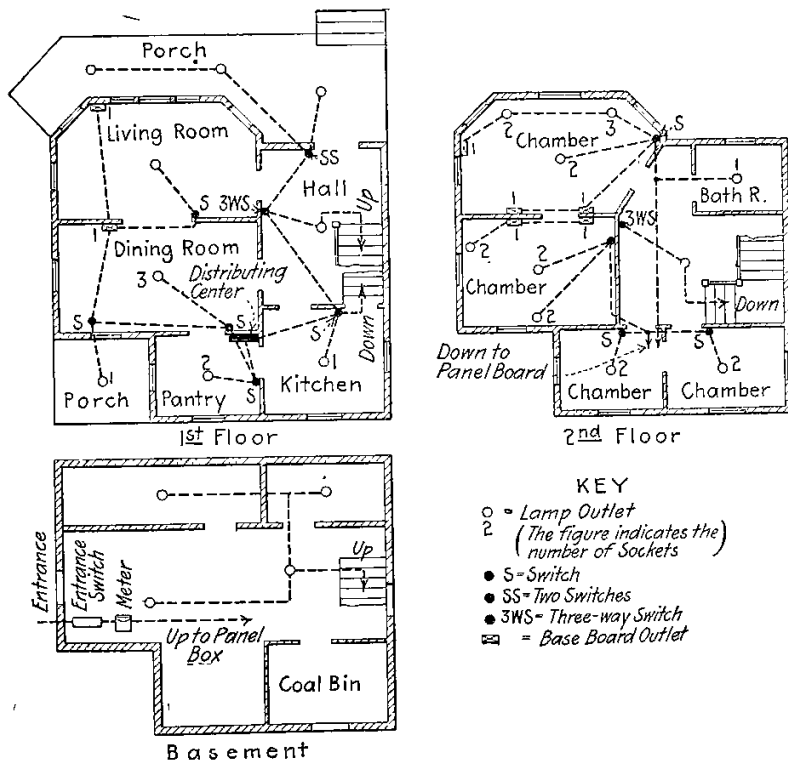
Wiring lay-out in a two-story house (Conduit Method).
